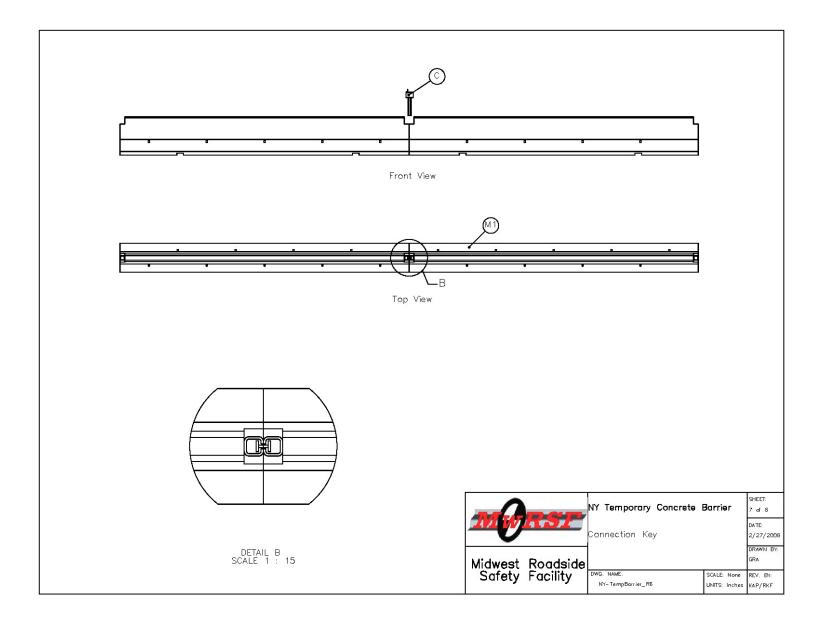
Temporary Concrete Barrier Connection Details (English), Test NYTCB-2
